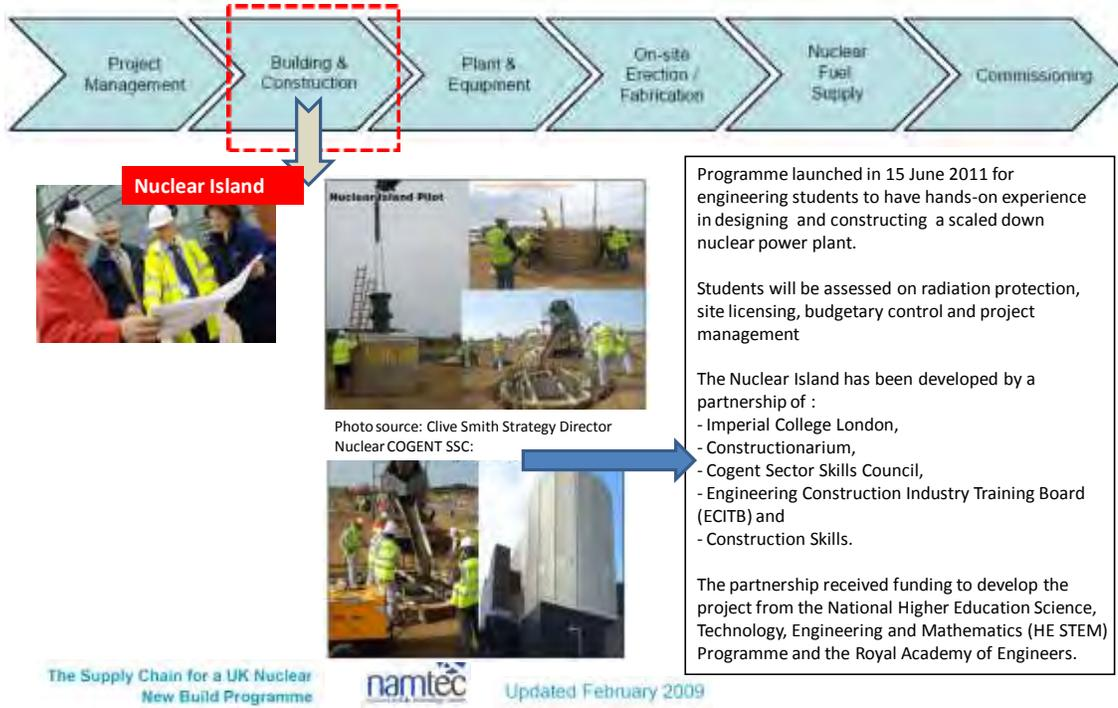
Nuclear Courses offered in the UK which supports Construction Stage - Building & Construction
